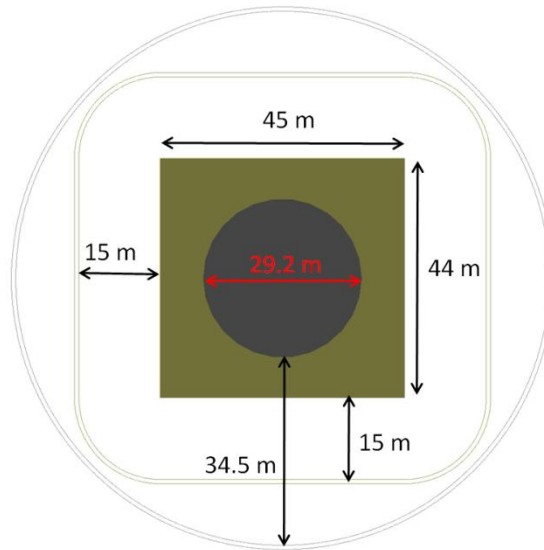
SW Anchor Block Scour Protection Plan View Comparison
